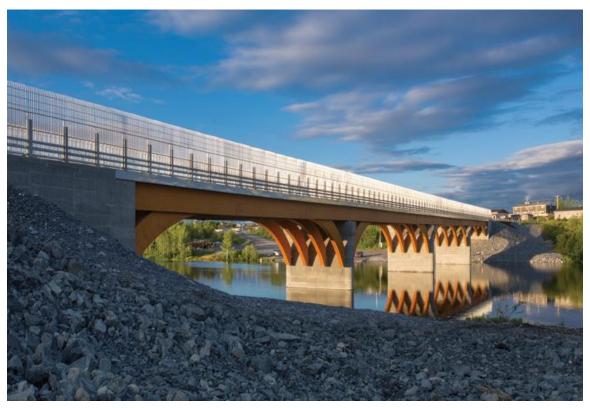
Mistissini Bridge is a 4-span bridge totaling 160m (525ft) long. The bridge is 9.25m (30ft) carrying two lanes of traffic, plus a pedestrian walkway on one side. It consists of glulam girders and arched knee-braces supporting a glulam deck with an asphalt wear-surface. (Forestrie Nordic, 2015)
